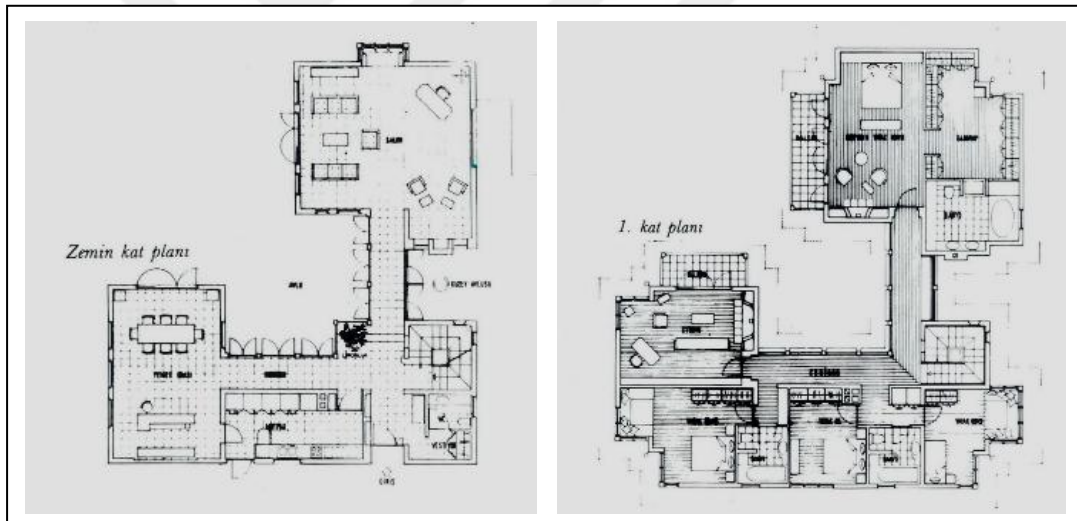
Floor plans of Zümrüt Akkoyunlu villas, 1987 [158] (m)
